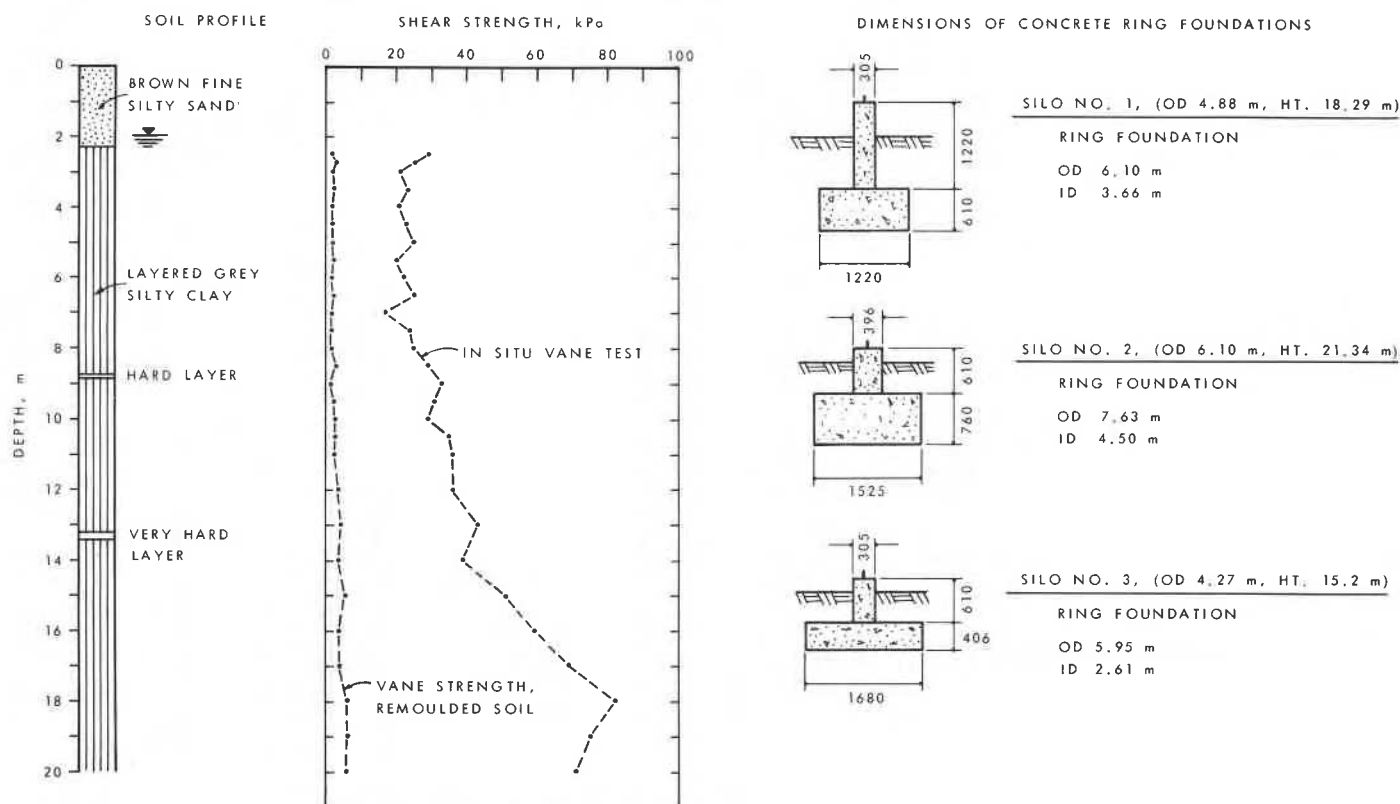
Soil profile, in situ vane shear strength and dimensions of concrete foundations for silos at Casselman.
